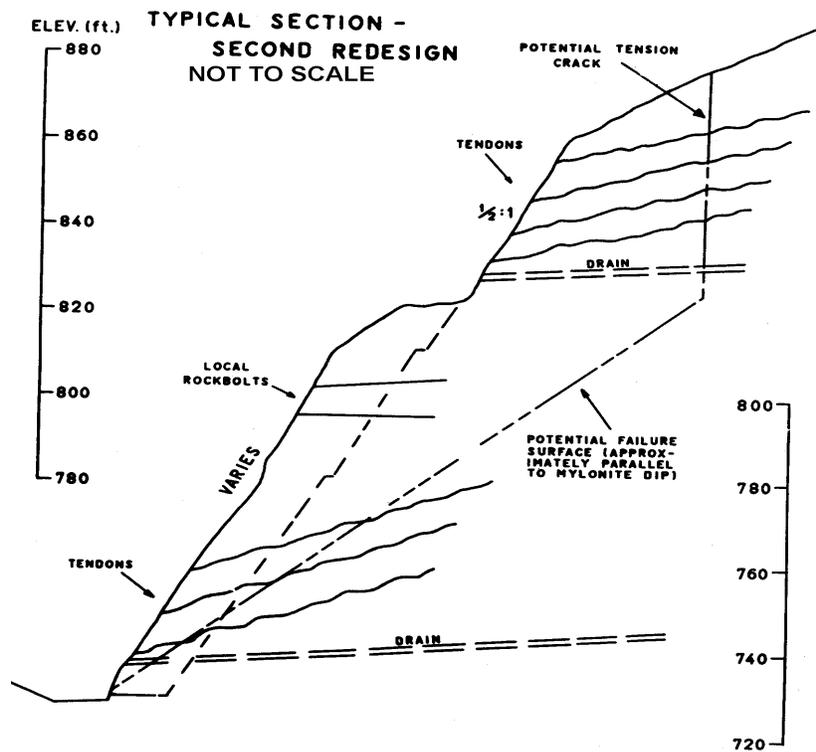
Typical Cross Section of Rock Cut Showing Rock Reinforcement (Fowler, 1976(b))
